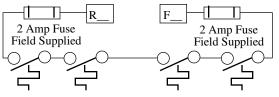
Refrigeration Thermostat w/ Header Mounted Solenoid
